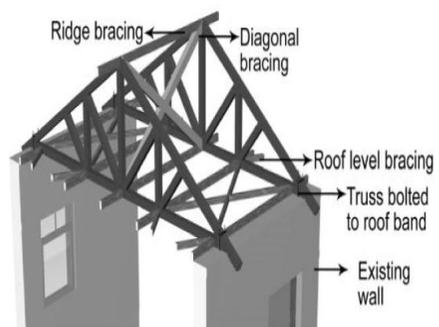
Bracing of sloped roof (IIT Roorkee, 2006)
